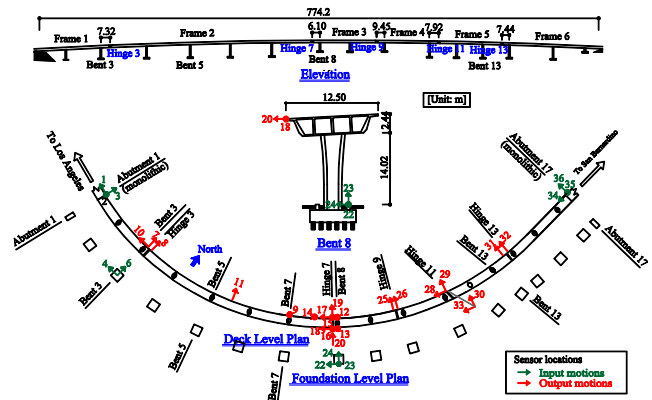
Plan, elevation, and sensor location of the Northwest Connector.
